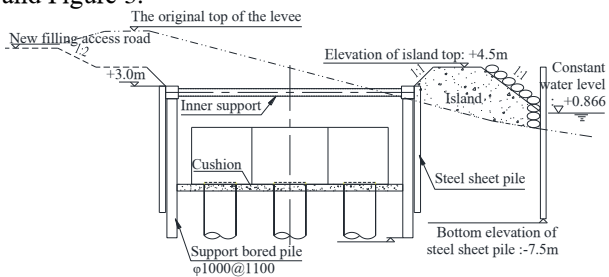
The elevation schematic diagrams of the foundation pit supporting structure
